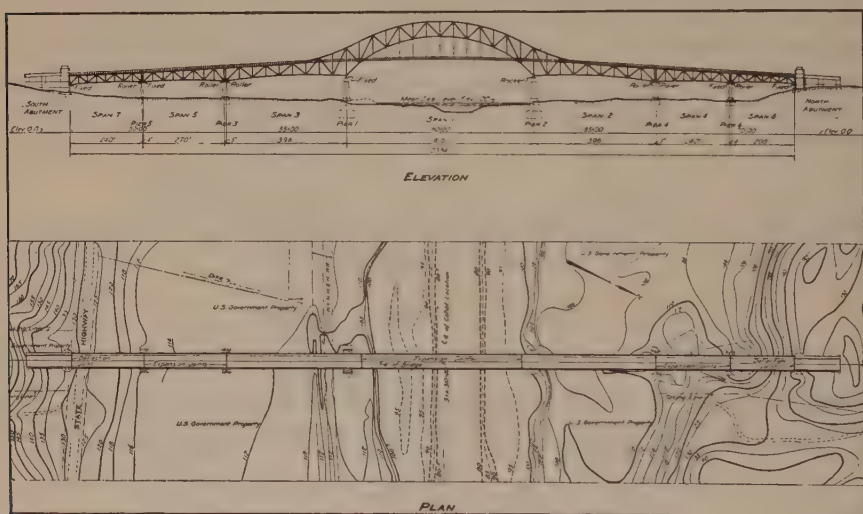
PLAN AND ELEVATION OF HIGHWAY BRIDGE AT SAGAMORE
